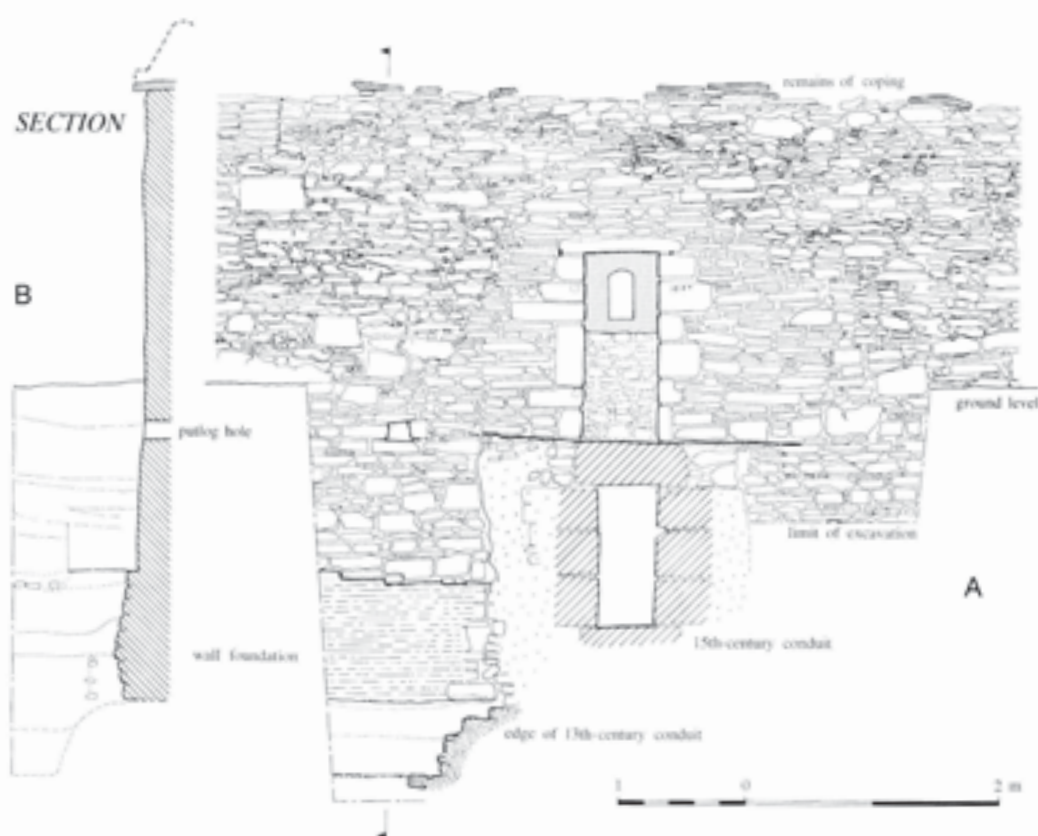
The Camery wall, and excavation Area 8. A West elevation of the wall, showing its full height, as exposed by excavation (cf. Fig. 366). The fifteenth-century conduit appears in cross-section. B Partial section through the wall and its offset foundation, together with abutting deposits, as seen in the north face of the excavation. Scale 1:60
